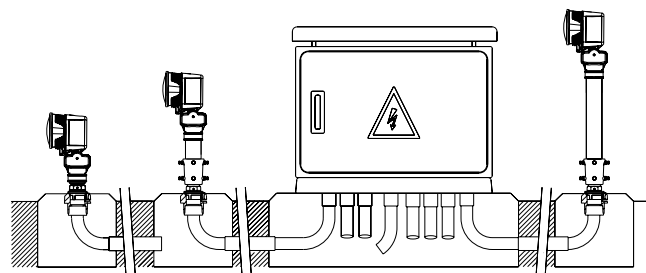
Typical installation of the FCU-3 with three flashing lights
